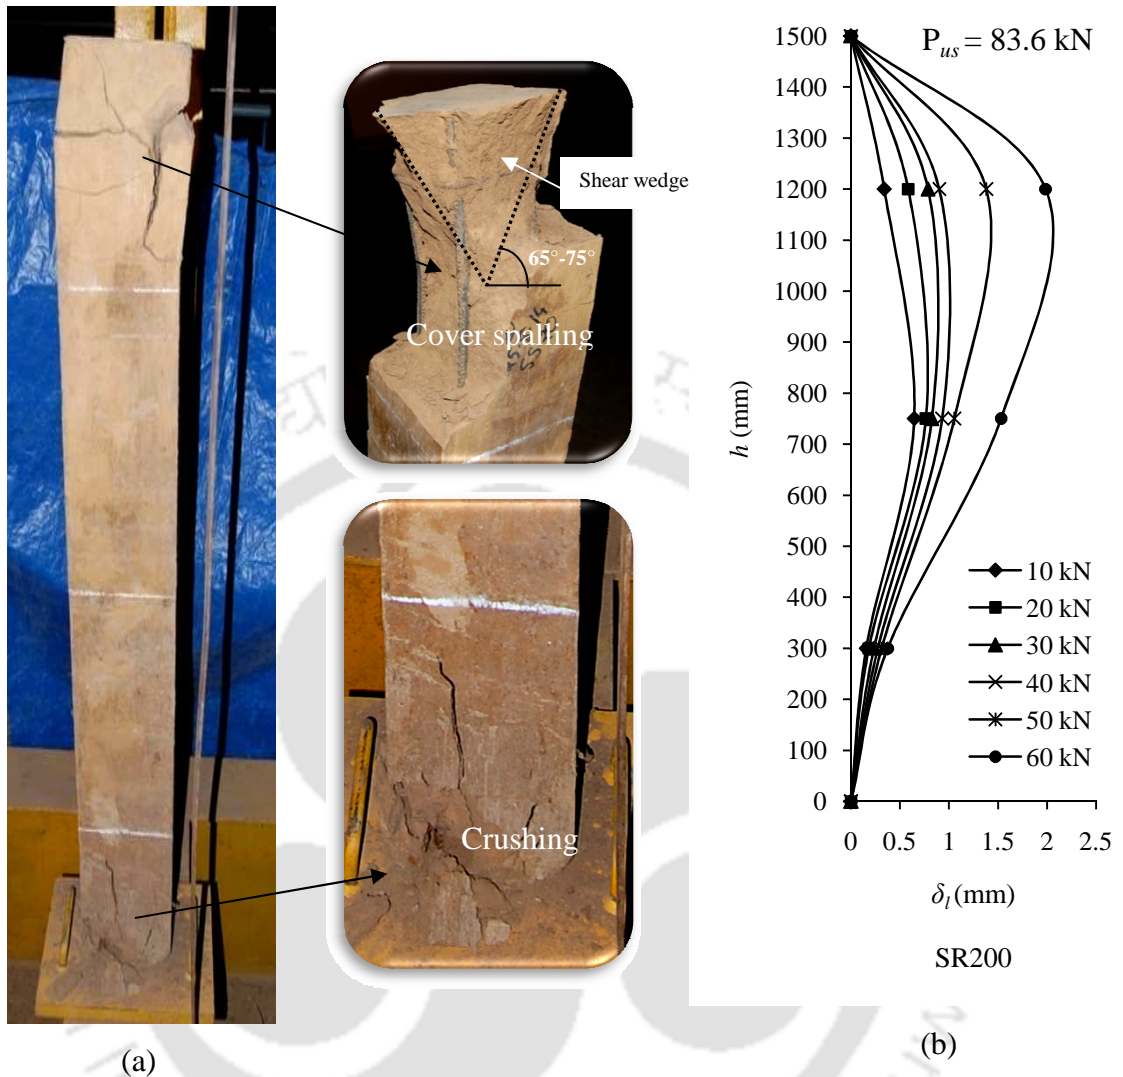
Failure of column with 200 mm tie spacing: (a) failure pattern; and (b) load-lateral deformation curve.
